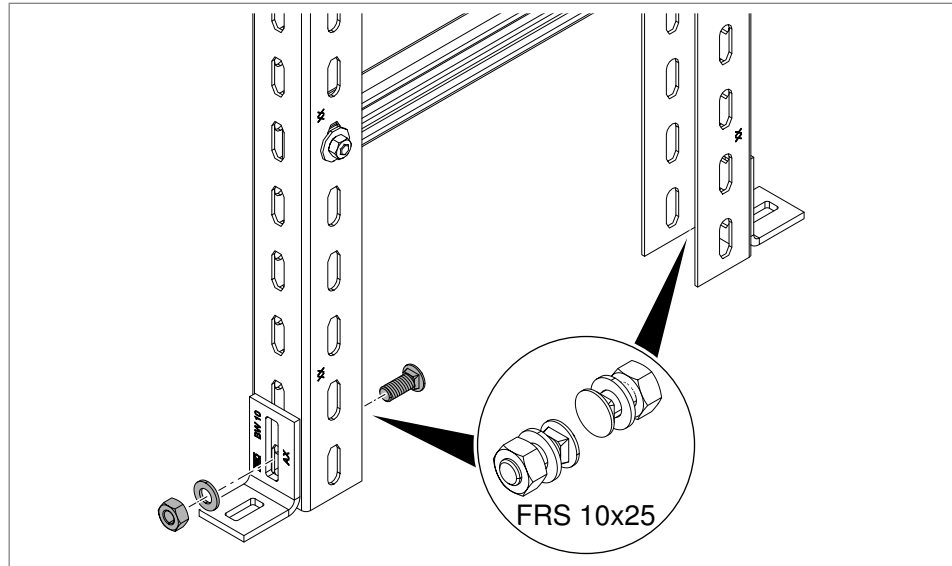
Fasten fastening bracket to vertical ladder SLM
